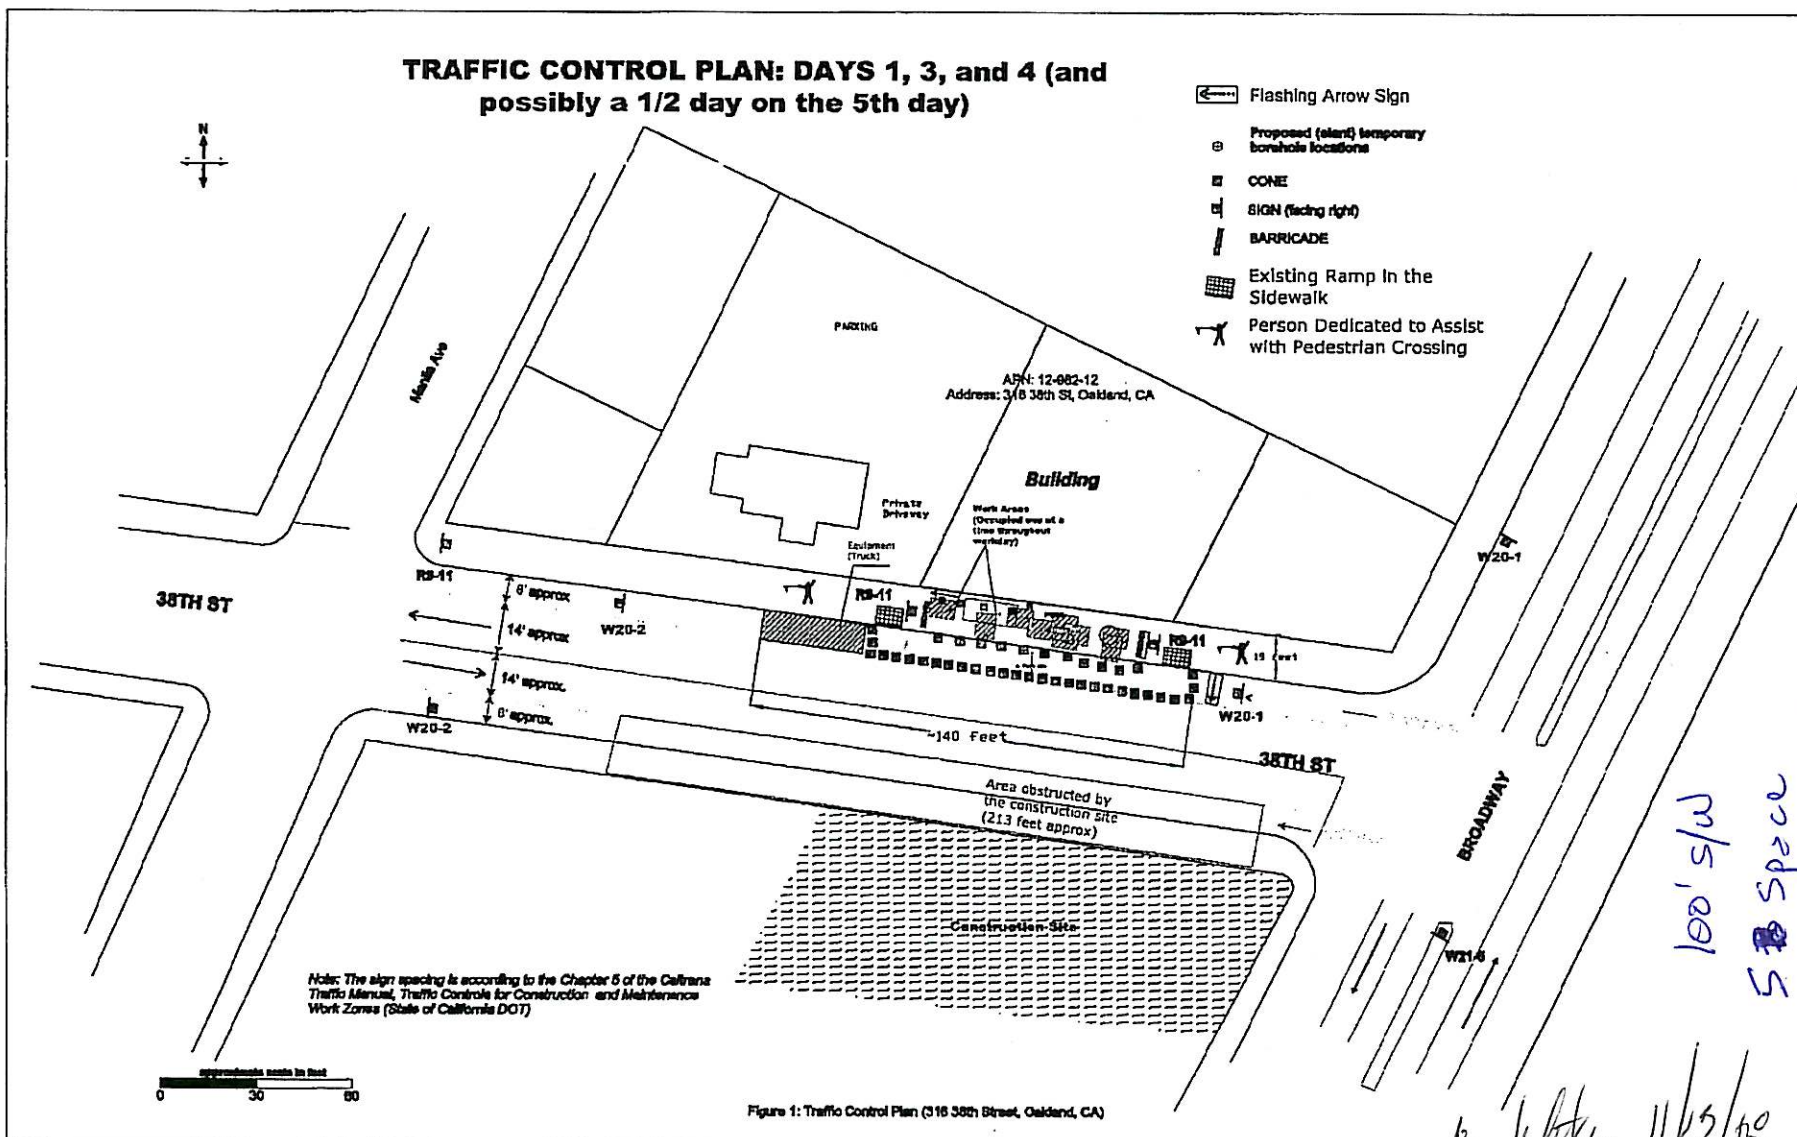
Traffic Control Plan (316 38th Street, Oakland, CA)
